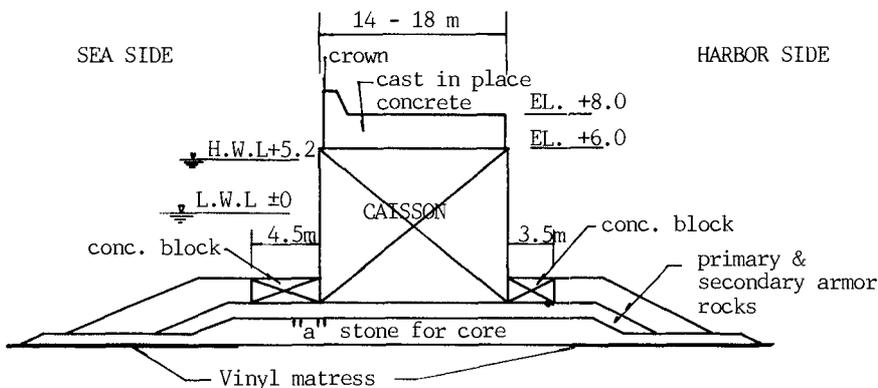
Typical cross section of composite type breakwater at Taichung Harbor
